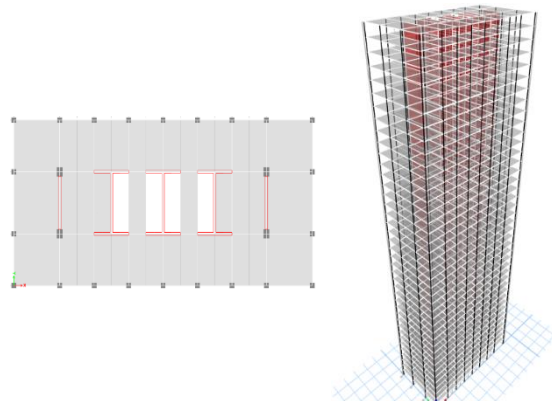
Plan view and 3D view of the 40-story rectangular building.
